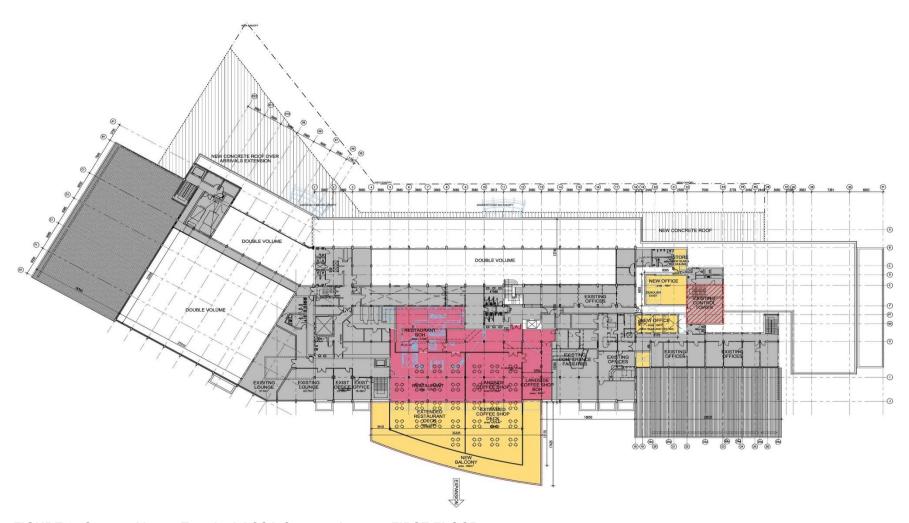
George Airport Terminal ACSA Concept Layout: FIRST FLOOR (Not to scale)
